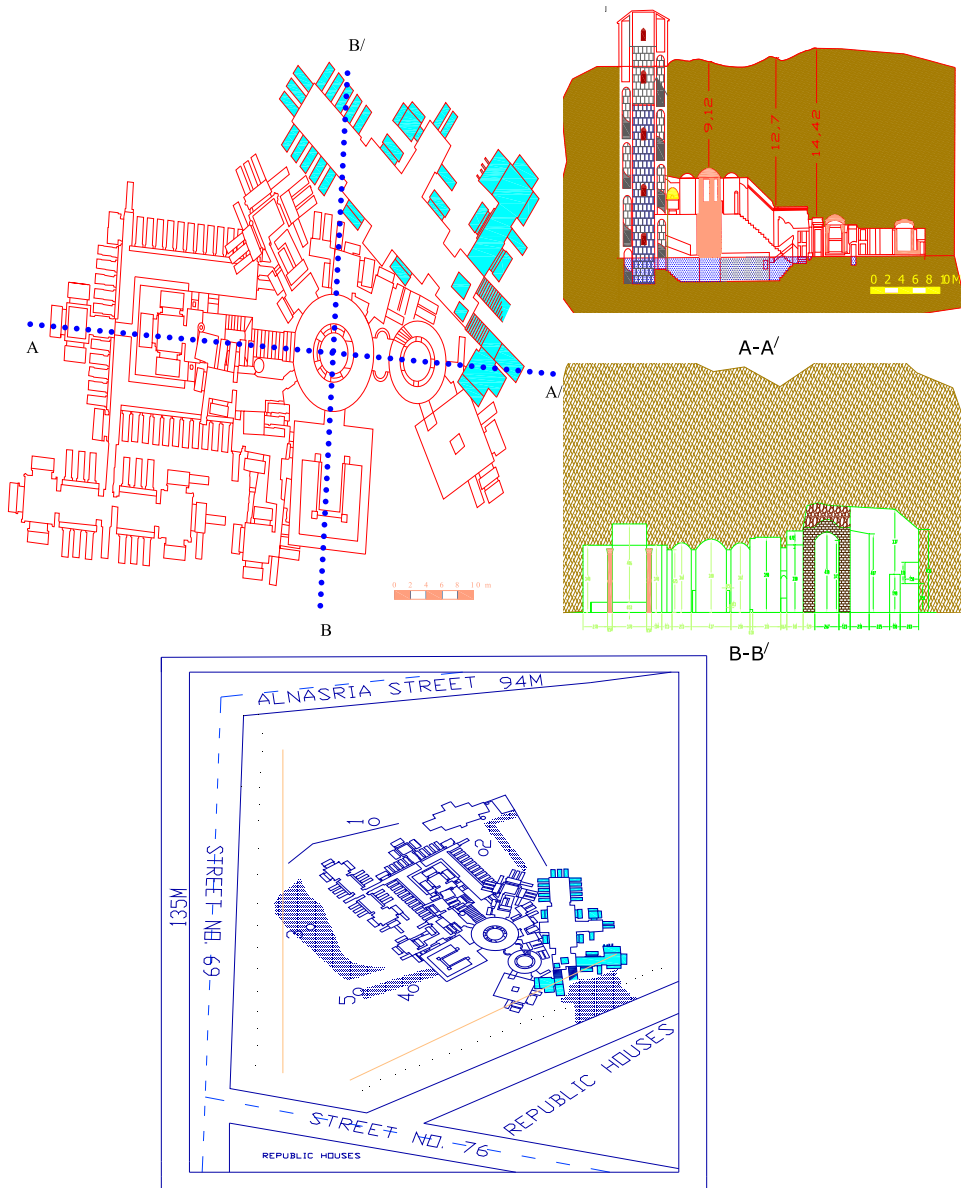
Plan view and the two main cross-sections of Catacombs of Kom El-Shoqafa. (a) cross-sections and (b) plan view.
